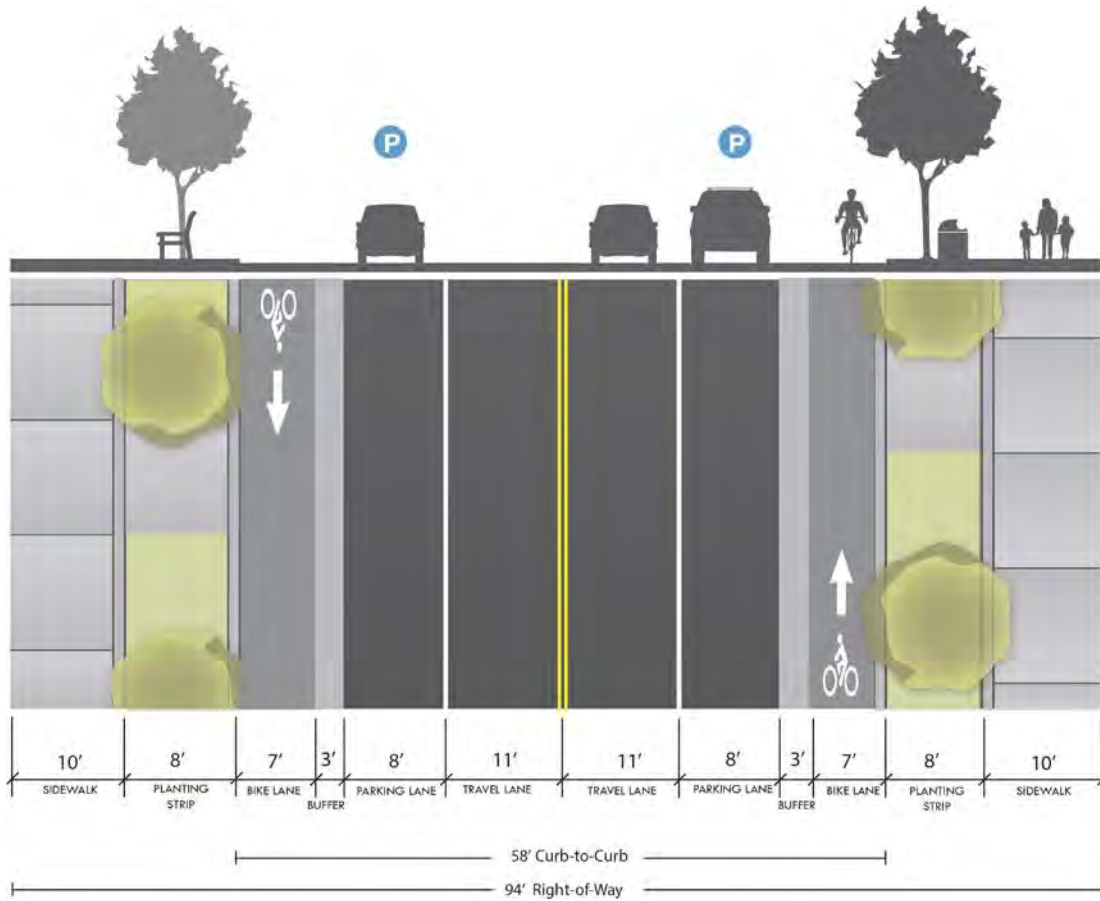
K: CAMPUS BOULEVARD SECTION C-C
